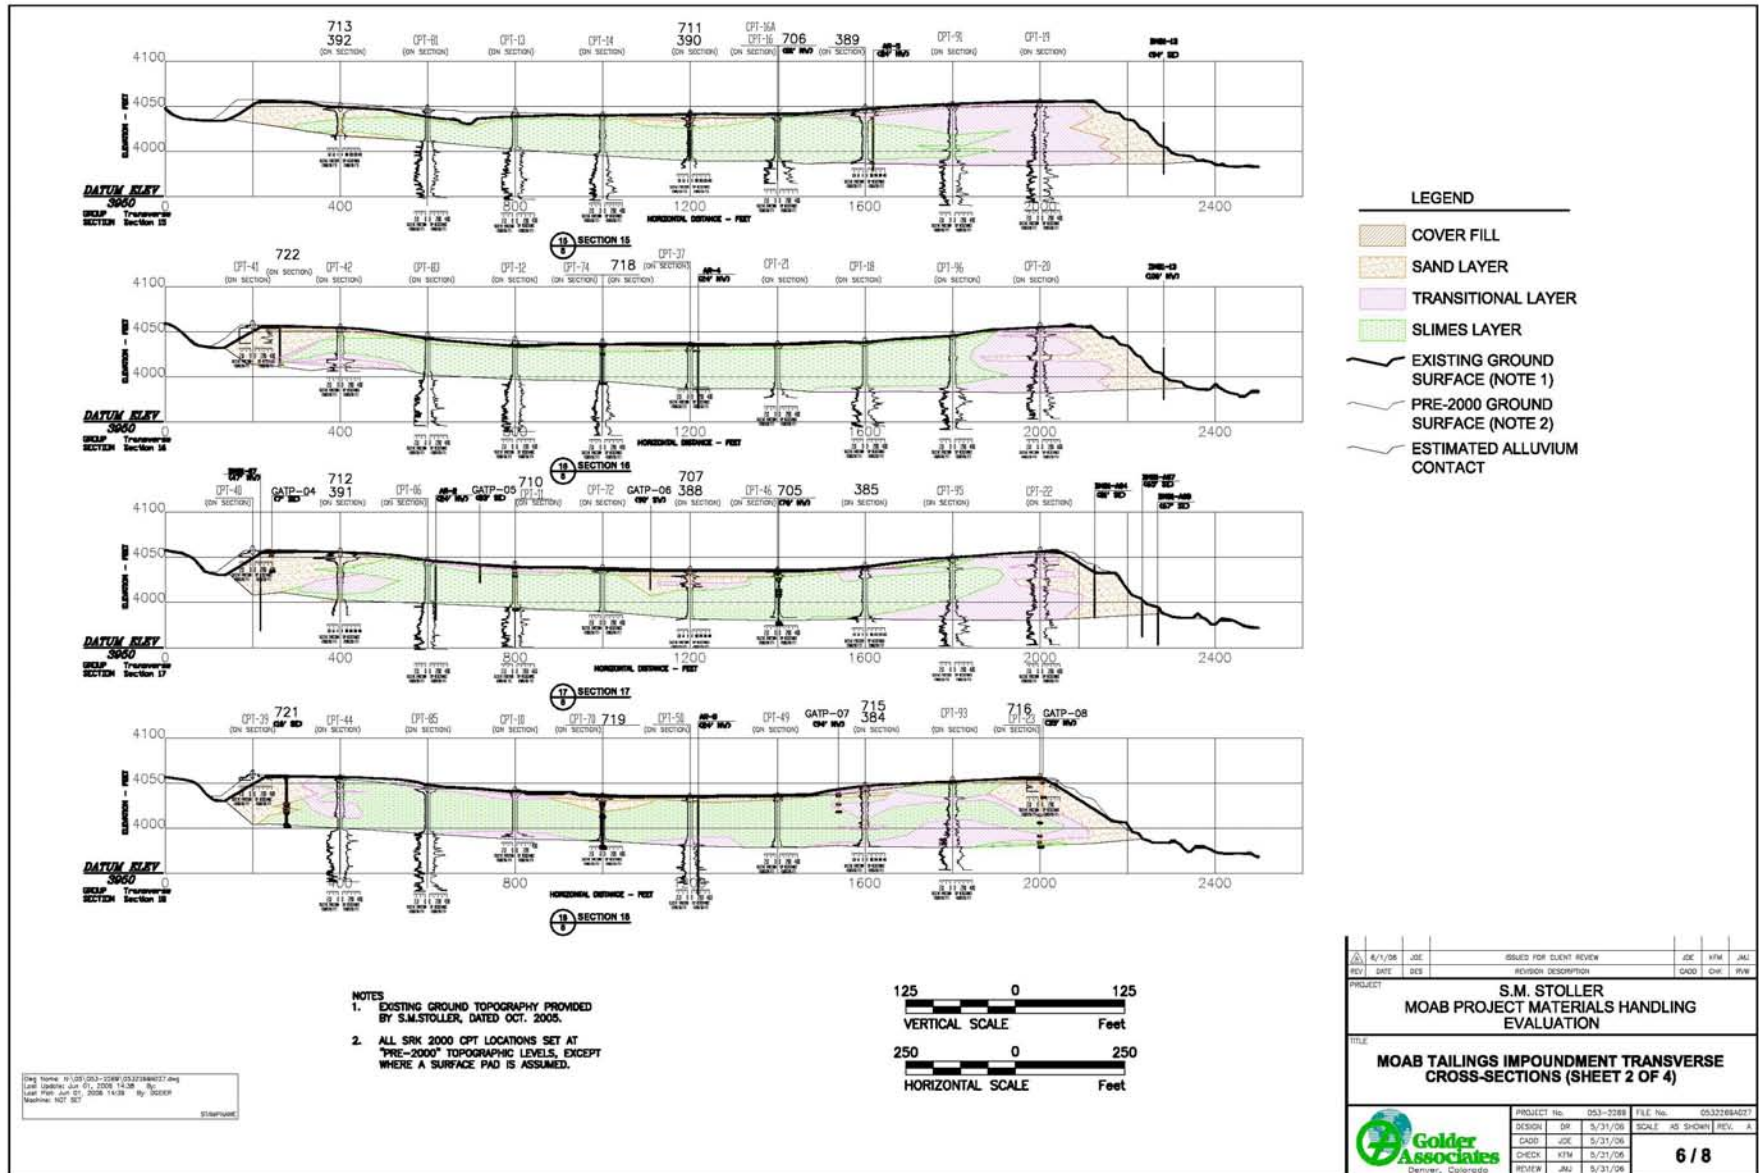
Moab Tailings Impoundment Transverse Cross Sections (Sheet 2 of 4)
